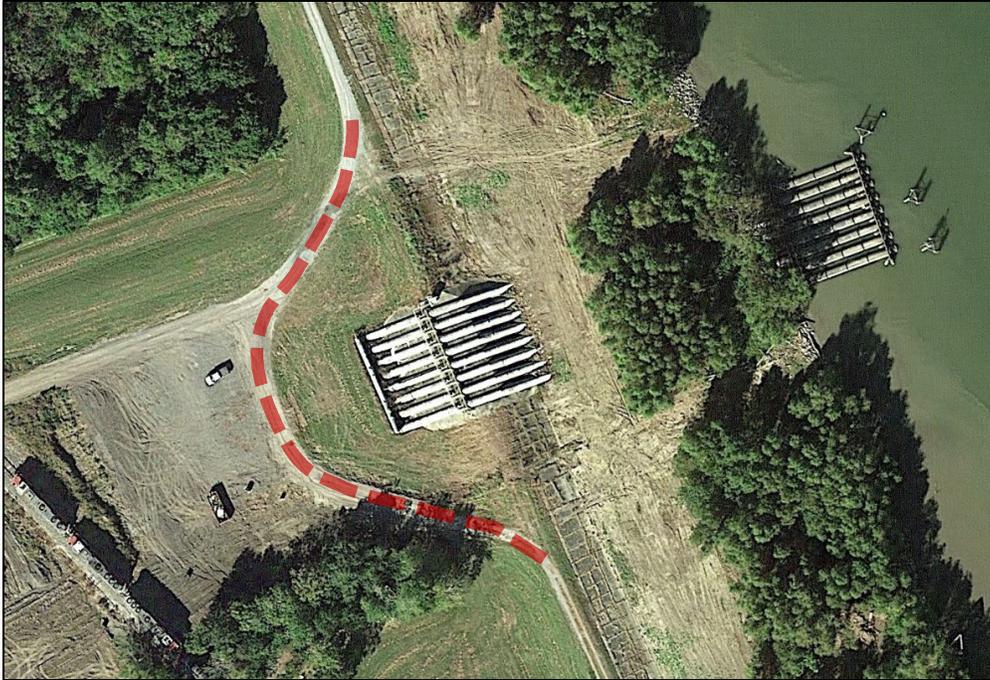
Elevated non-passable pipes prevent vehicular crossing.
